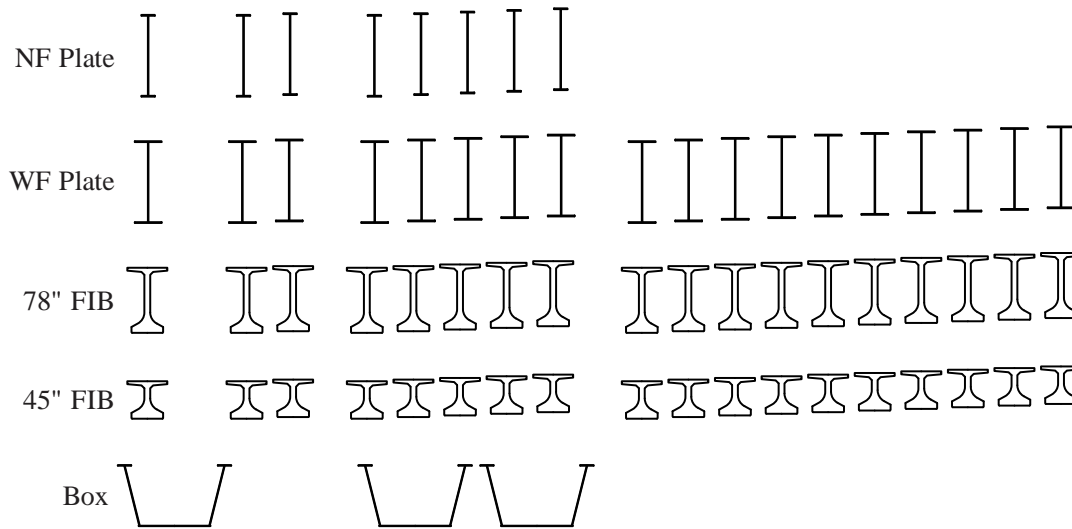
Girder groupings investigated in study (girder-to-girder spacing not drawn to scale; cross-slopes vary)
